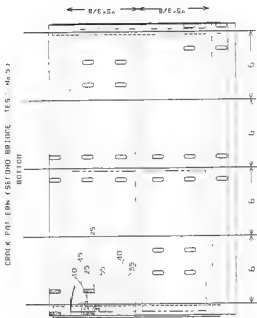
Bottom Cracking Pattern (Second Bridge - Test No 5)
